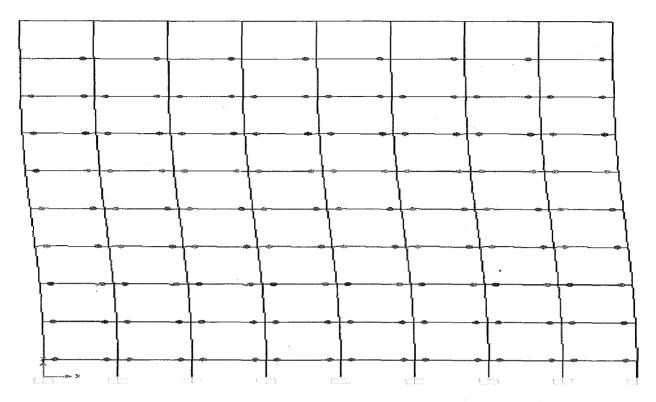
Yield Pattern at Ultimate Point for 9-Storey Building in Longitudinal Direction Designed as SMRF with Strong Column-Weak Beam
